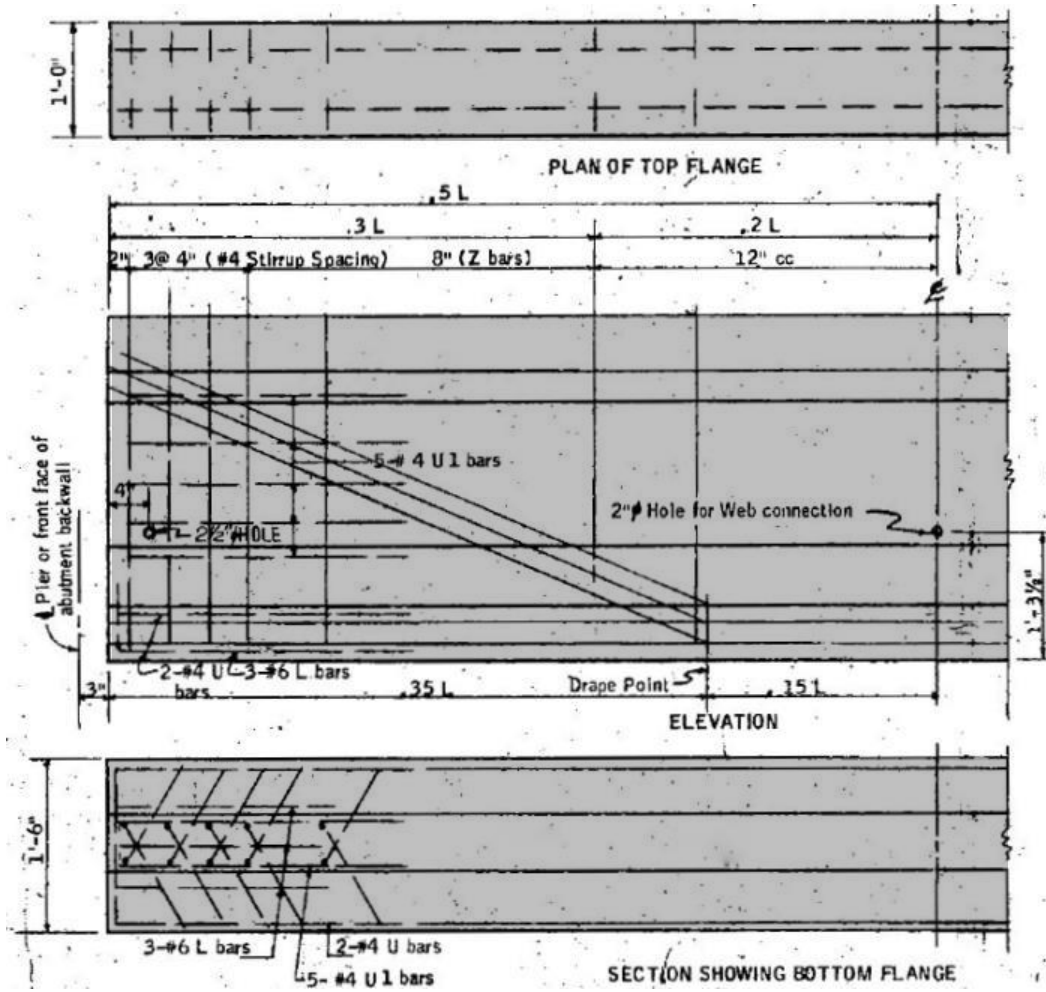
Original ODOT Reinforcing Diagram for Girder
